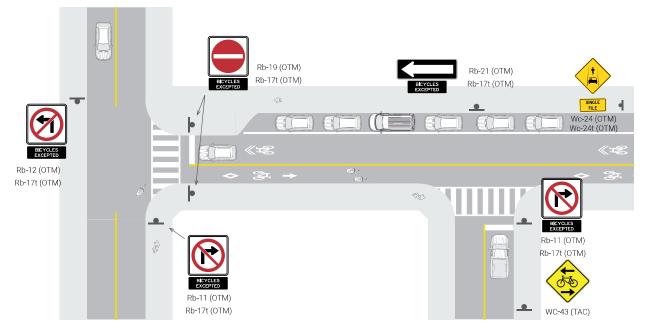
Contraflow Bicycle Lane (on-street parking on one side of the road)
